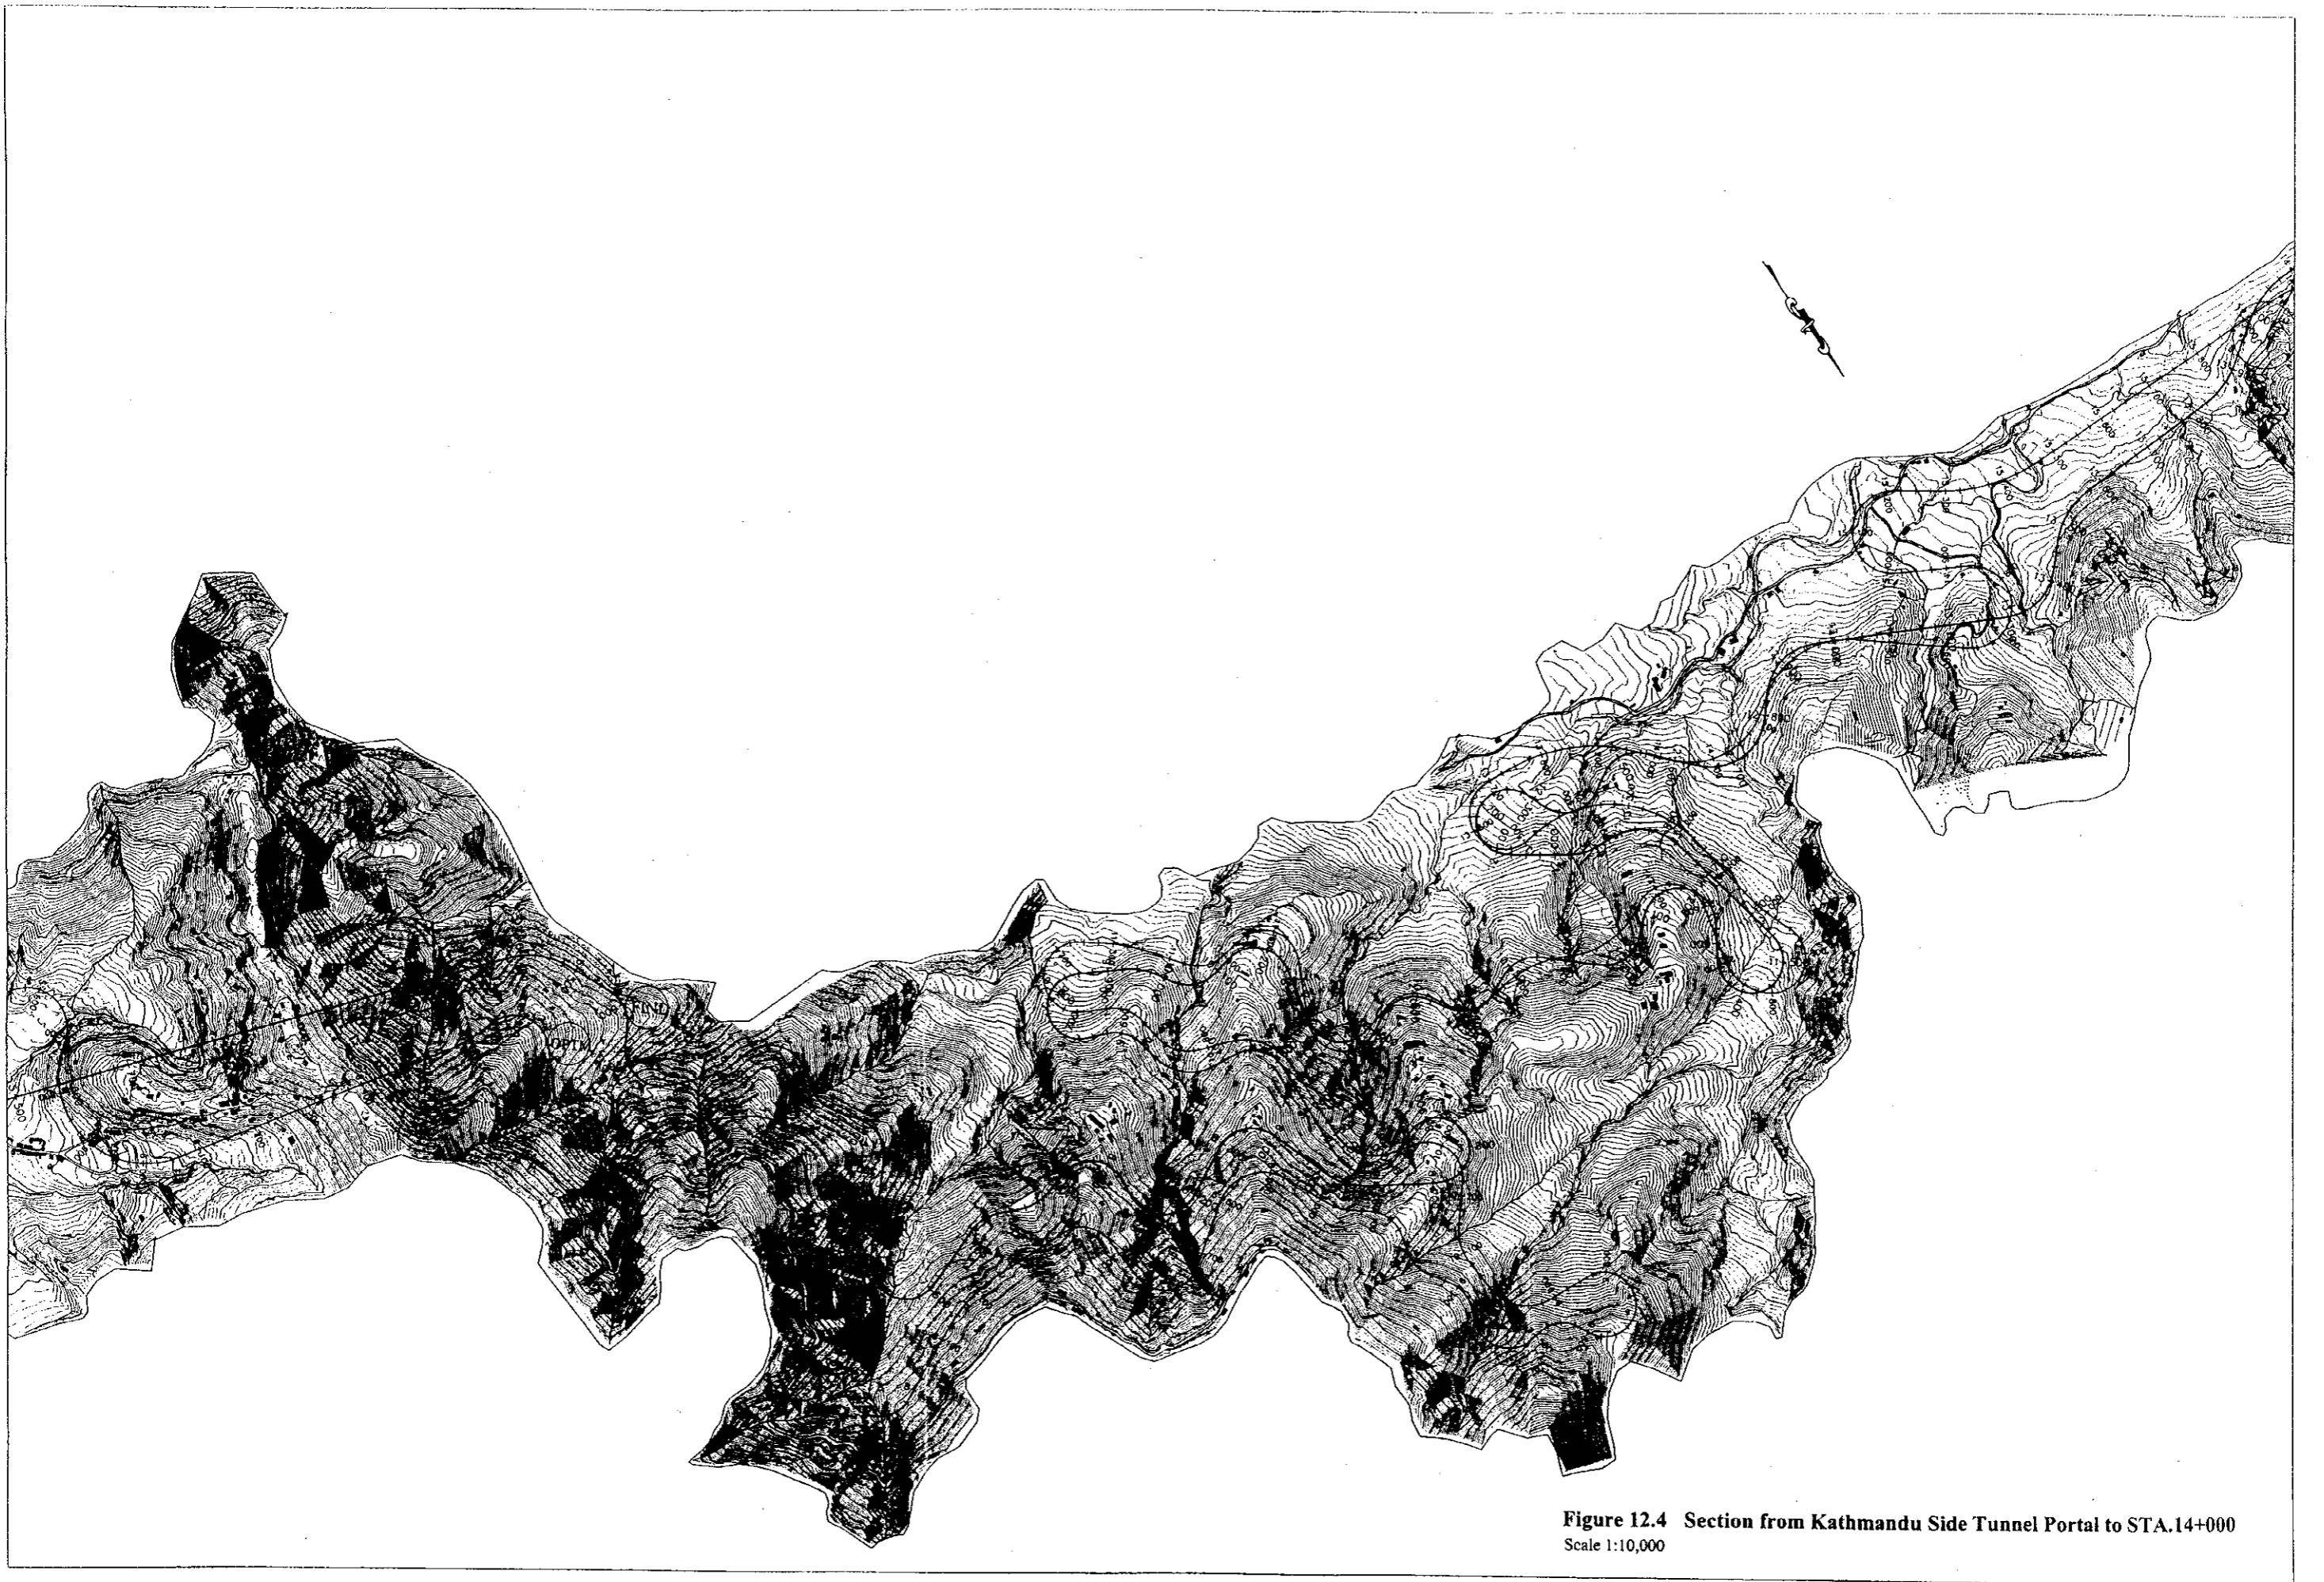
Section from Kathmandu Side Tunnel Portal to STA.14+000
